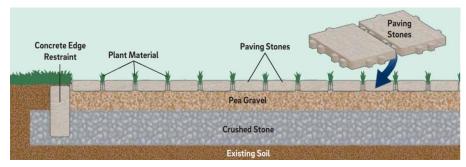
Diagram of permeable pavement with vegetation (Permeable Paving – Green Stormwater Infrastructure, n.d.)
